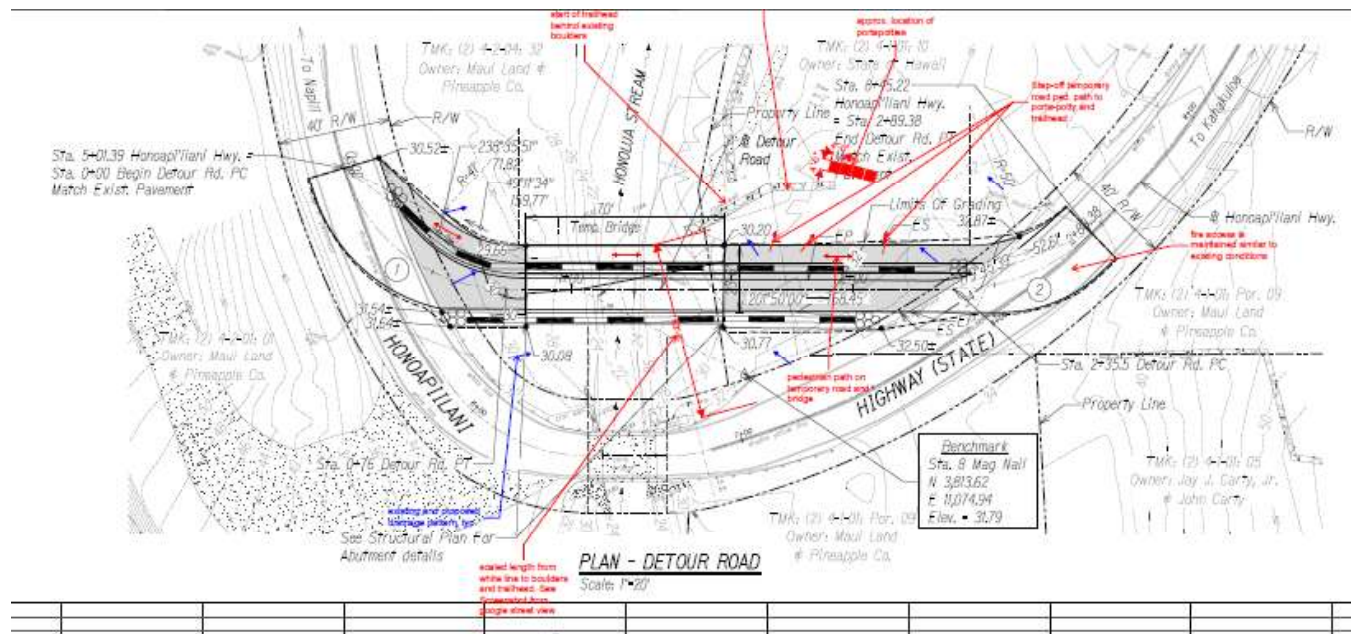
Site Plan for Temporary Bypass Road and Bridge
